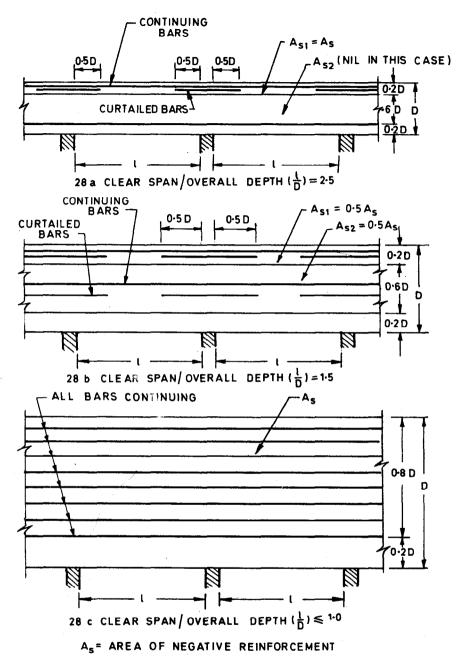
Disposition of Negative Reinforcement in Continuous Deep Beams (Clause 28.3.2)
